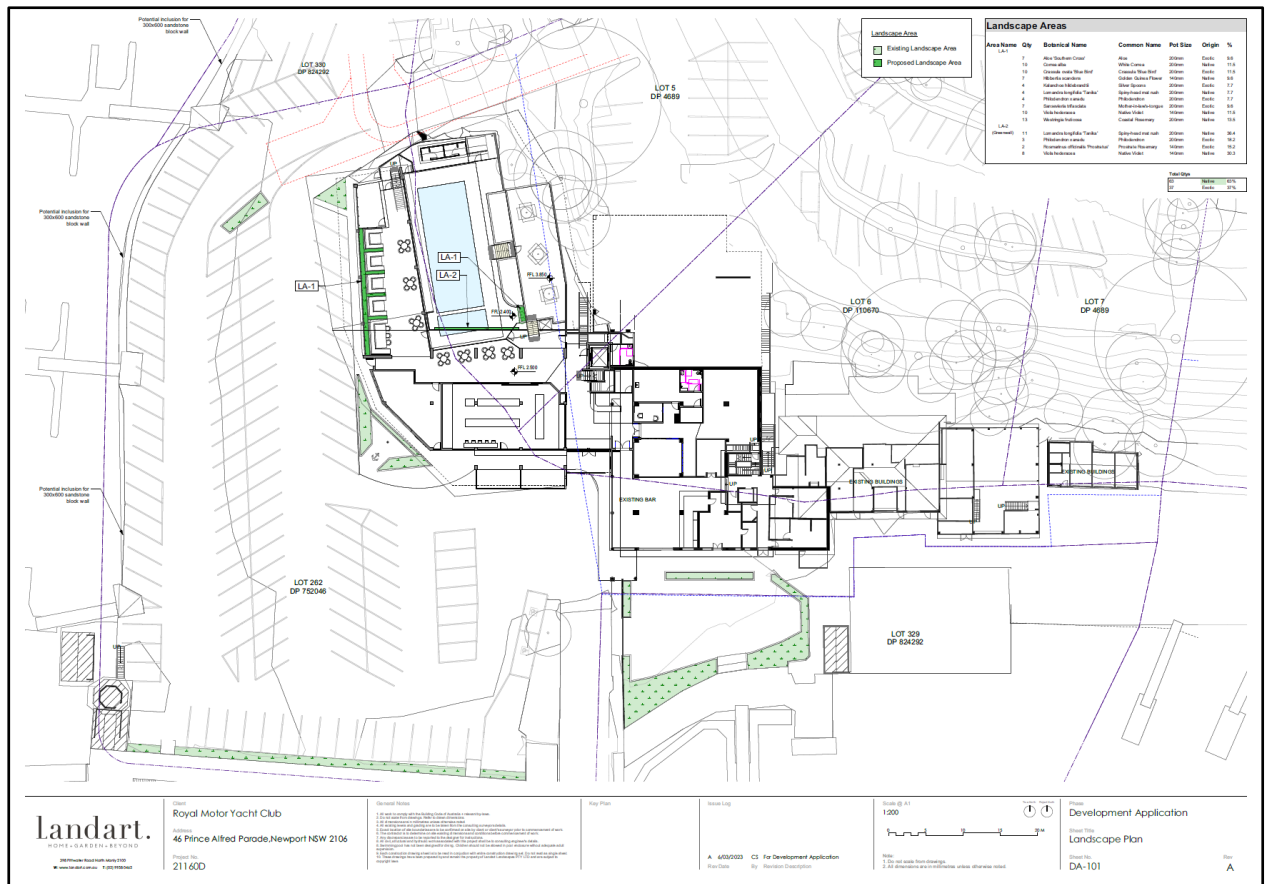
Landscape Plan (source: Landart Landscape Architects)
